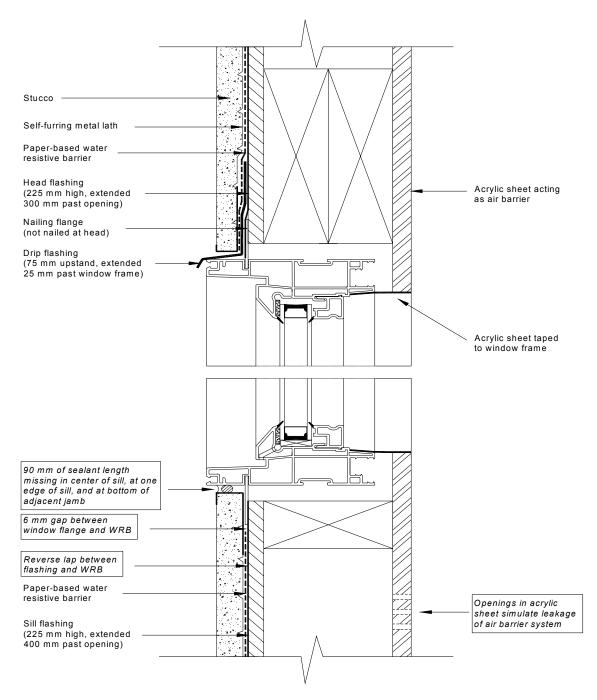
Wall/window interface for specimens No. 2 and No. 4 - vertical section
